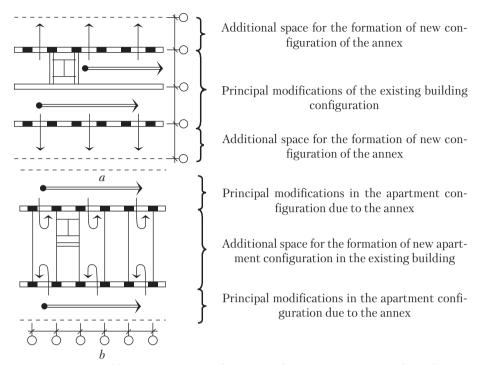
Options and limitations on reconfiguration of FMSRH apartments, depending on the type of framing scheme: a — with three longitudinal bearing walls; b — with transversal bearing walls
